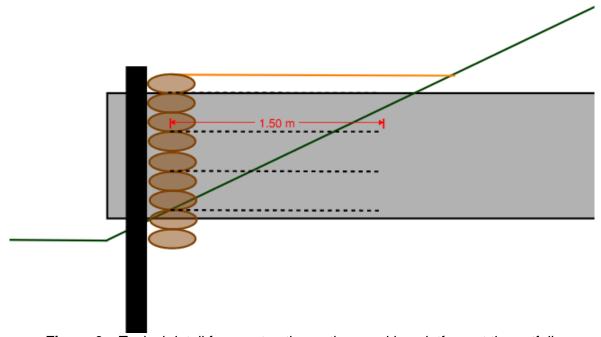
Typical detail for constructing path or working platform at the outfall.
